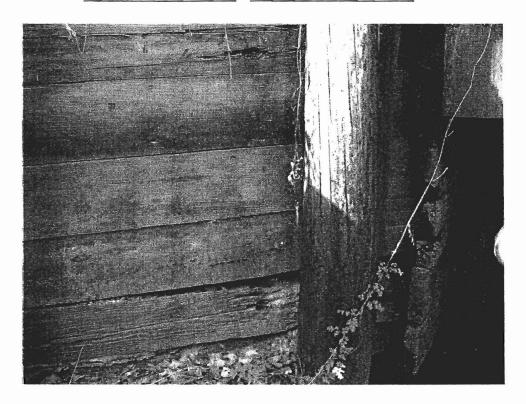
Decayed Sheeting in the Southwest Wingwall and at the South End of the West Abutment. Note Loss of Fill.
